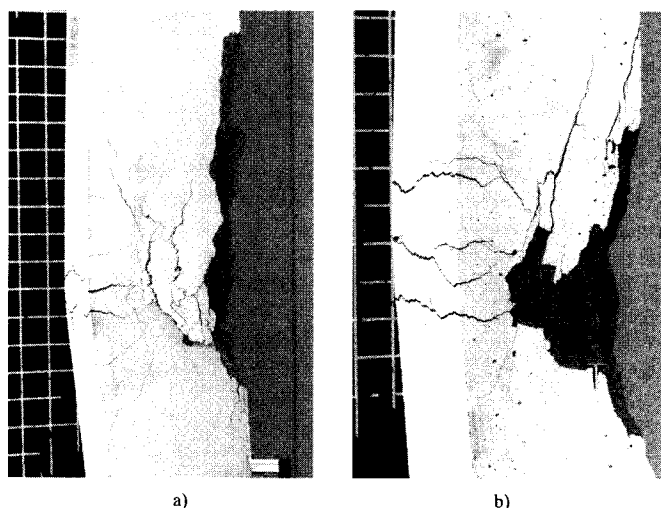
Final Failure of Specimens: (a) #27 (3.0 m Normal-Strength Concrete); and (b) #29 (3.0 m High-Strength Concrete); Photos Were Taken after Completion of Tests
